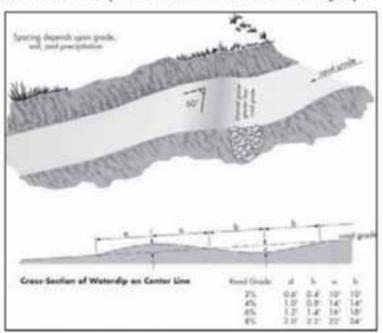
Plan and Cross-Section Views - Road Drainage Dip
